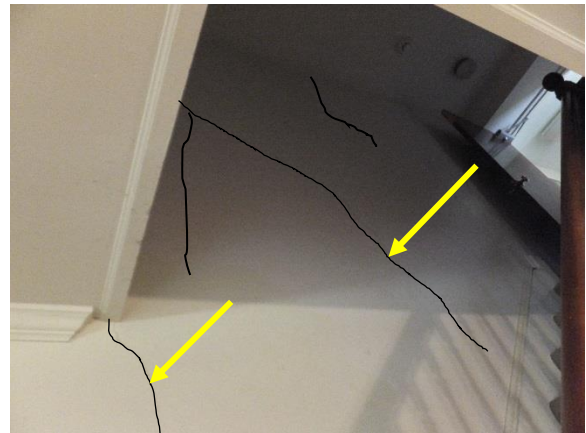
Diagonal cracking at stairwell. Crack traced for clarity.
